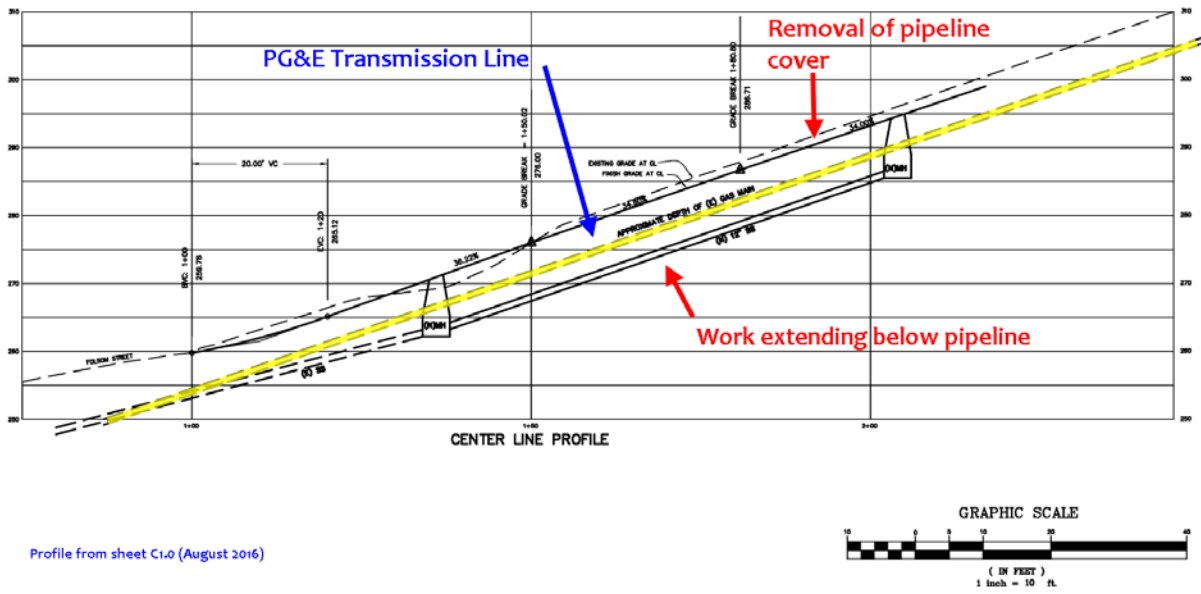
Plans call for removal of pipeline cover as well as construction work below the existing pipeline.
